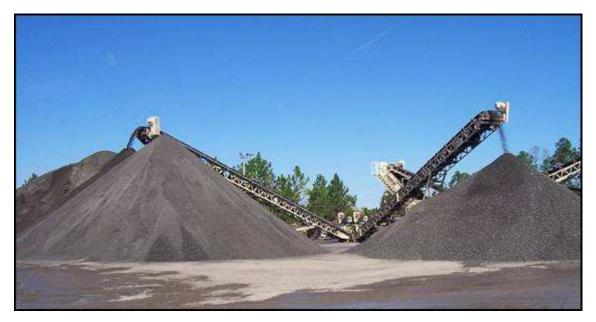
RAP Stockpiles at an Asphalt Concrete Production Plant (Copeland 2010)
